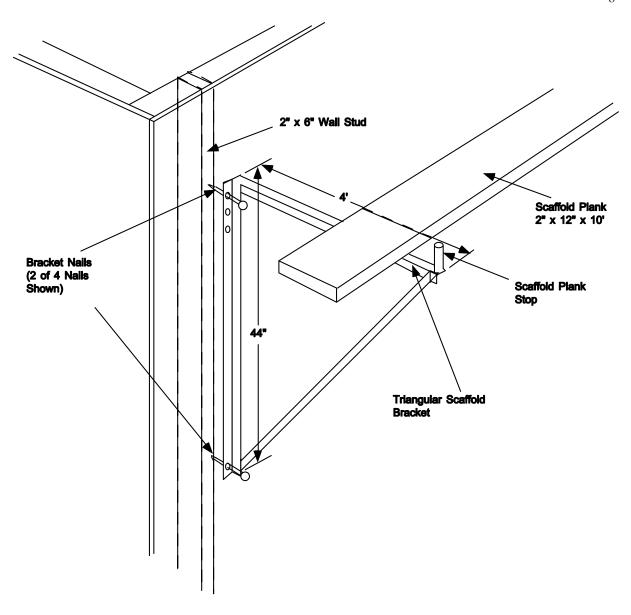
Scaffold Bracket Nailed To Corner Of Room Not To Scale
